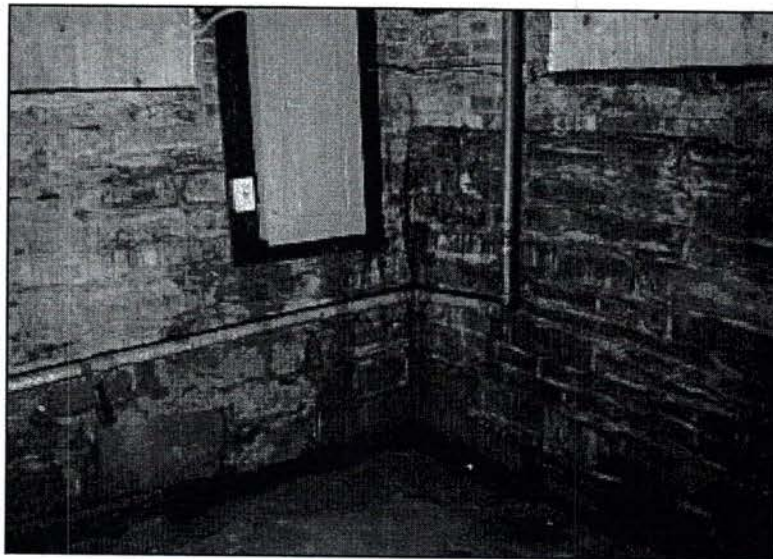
Northeastern corner of Room 000 showing the different finishes between the eastern and northern walls of the foundation. The stones on the eastern wall are cut, while the stones on the northern wall are rubble. Water staining and efflorescence is visible along the northern and eastern walls of this room, and water infiltration is seen in the northeastern corner.
